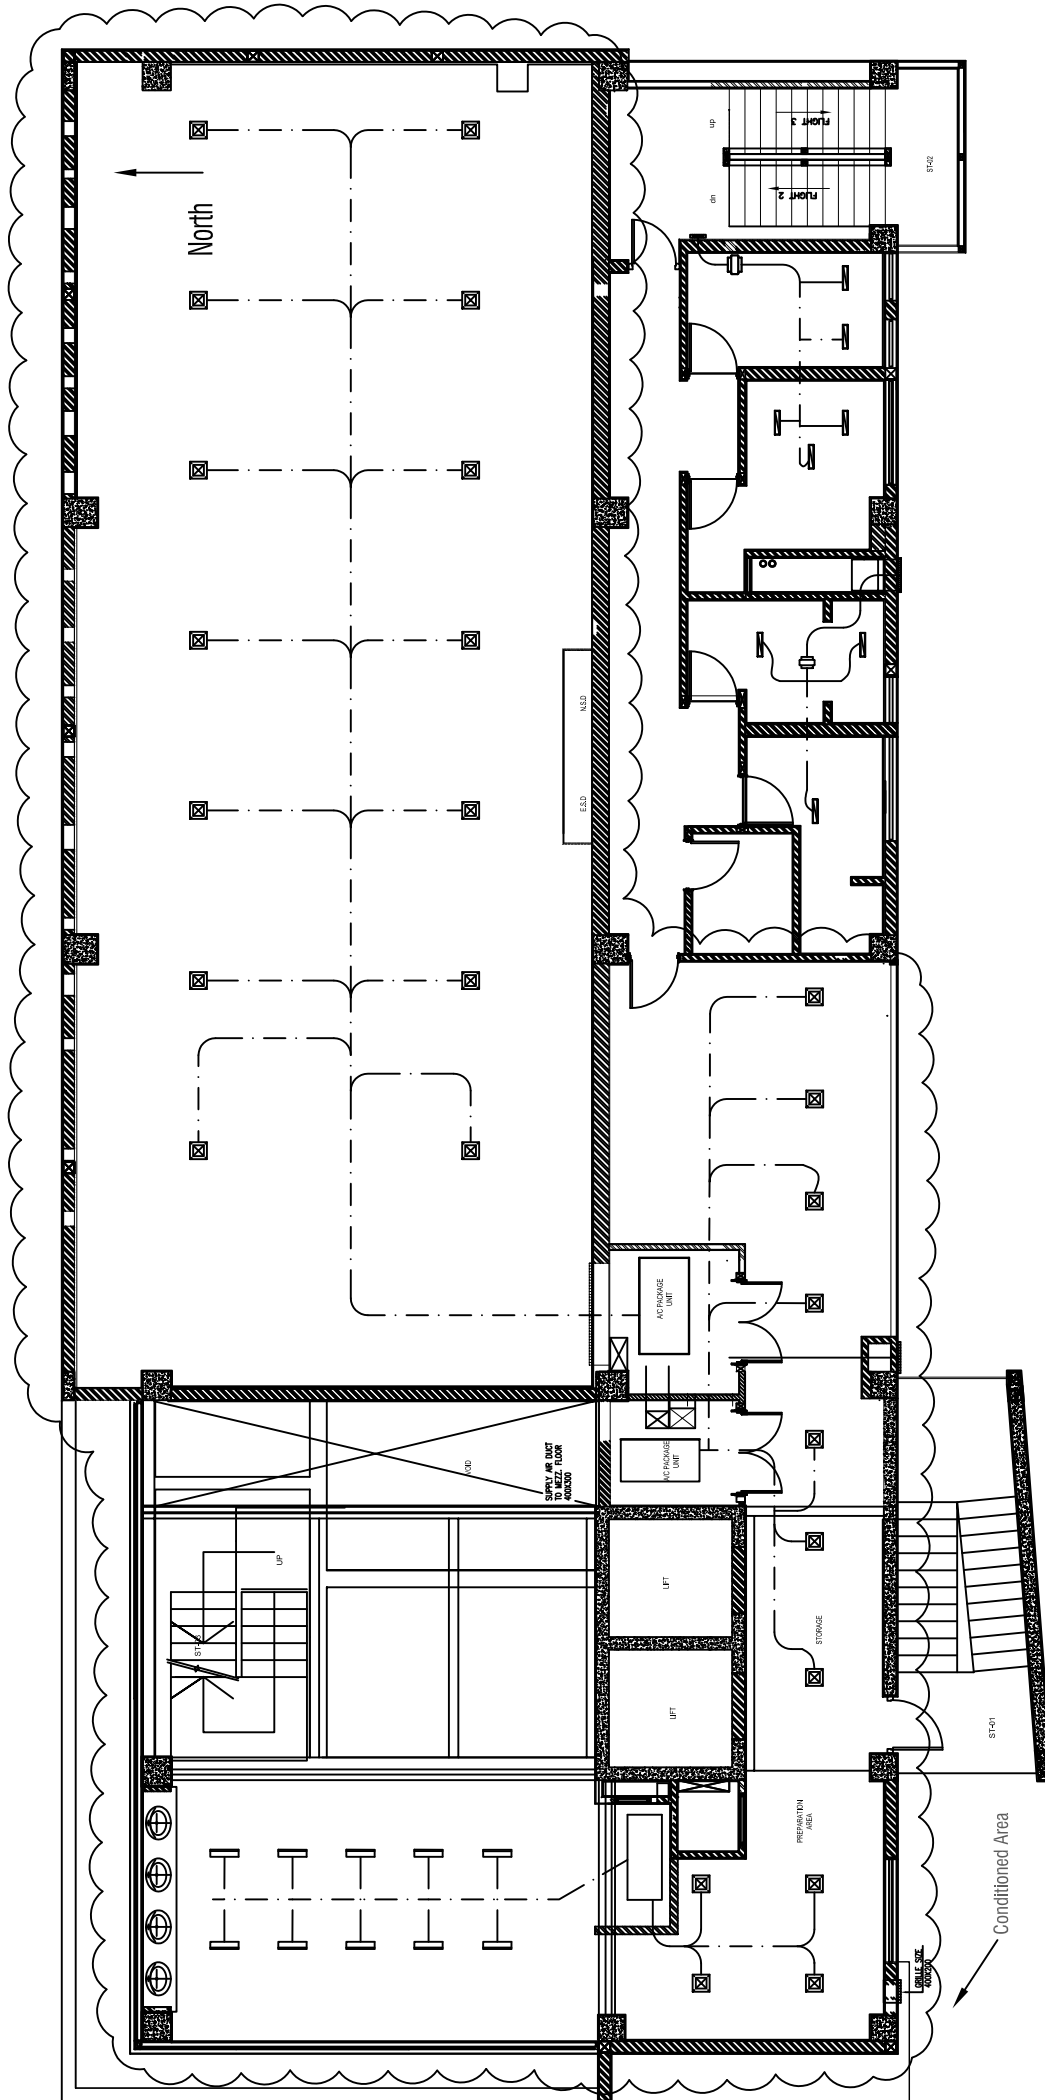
Ceylinco Life Insurance Building - Eighth Mezzanine Floor
